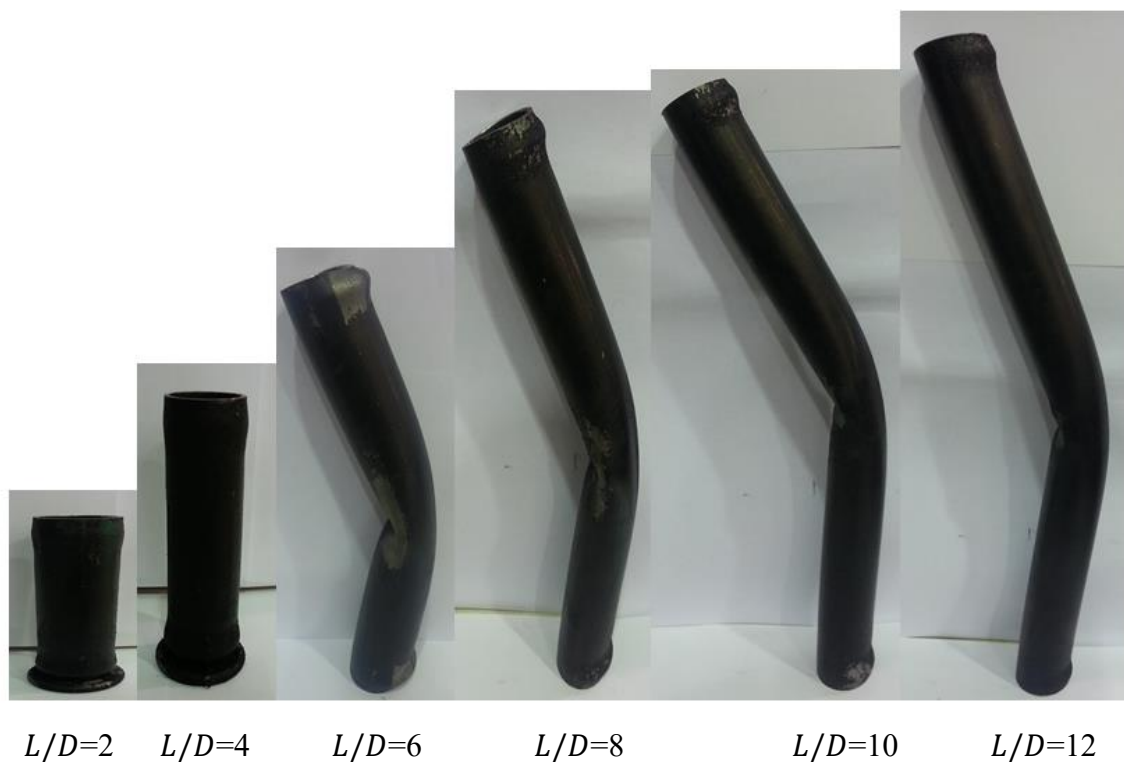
Typical failure modes of cold-formed steel tube specimens
